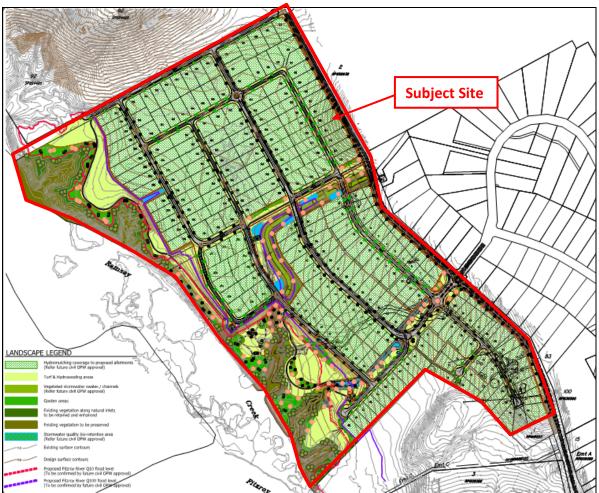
Proposed Layout (modified from Contour Consulting Staging Plan)
